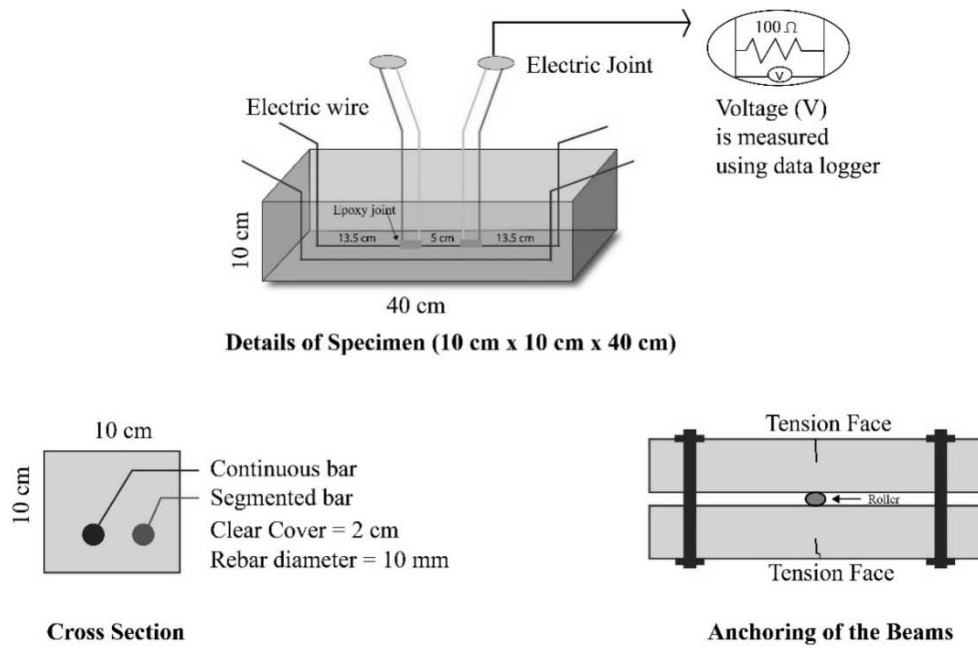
Reinforcement Detailing and Cable Connection Details
